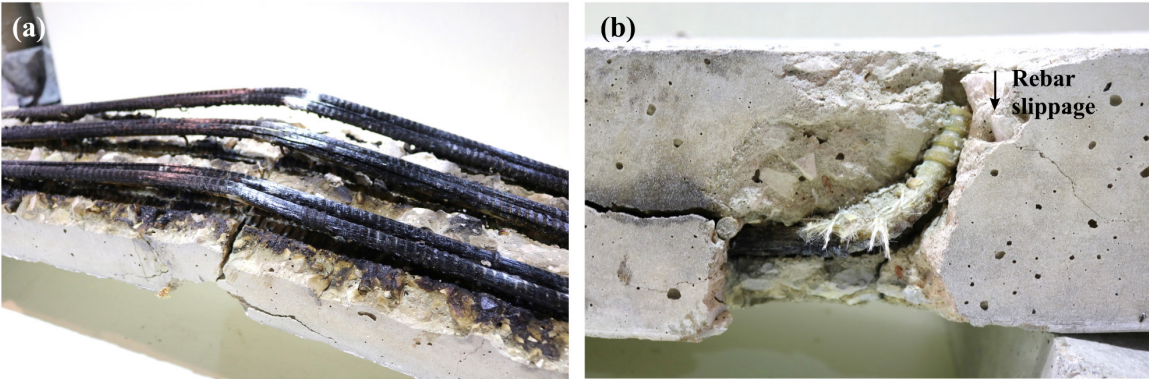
Detail of slab RBP-LS84.5(B)-D12 after failure and removal of the concrete cover: (a) longitudinal rebars after removal of concrete cover and (b) extremity of bent-end splices.
